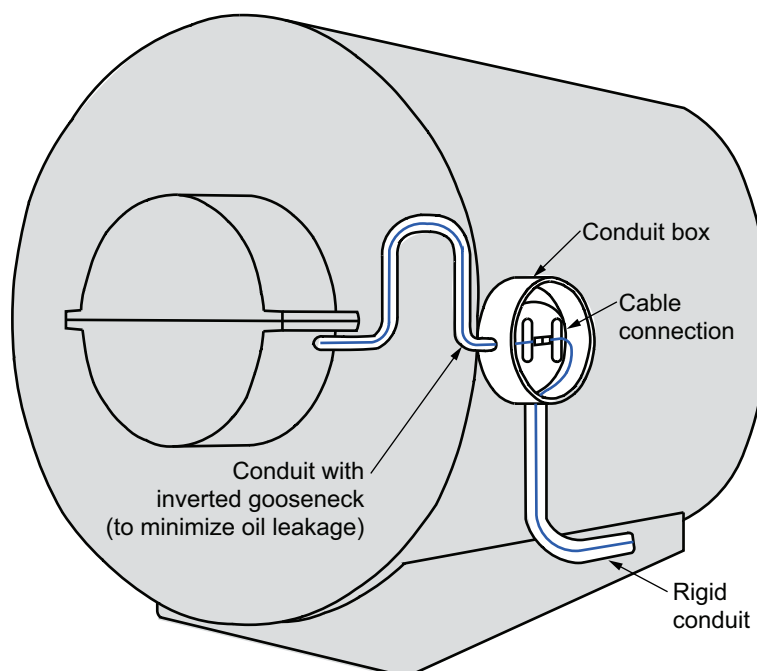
Inverted Gooseneck Trap Conduit Arrangement
